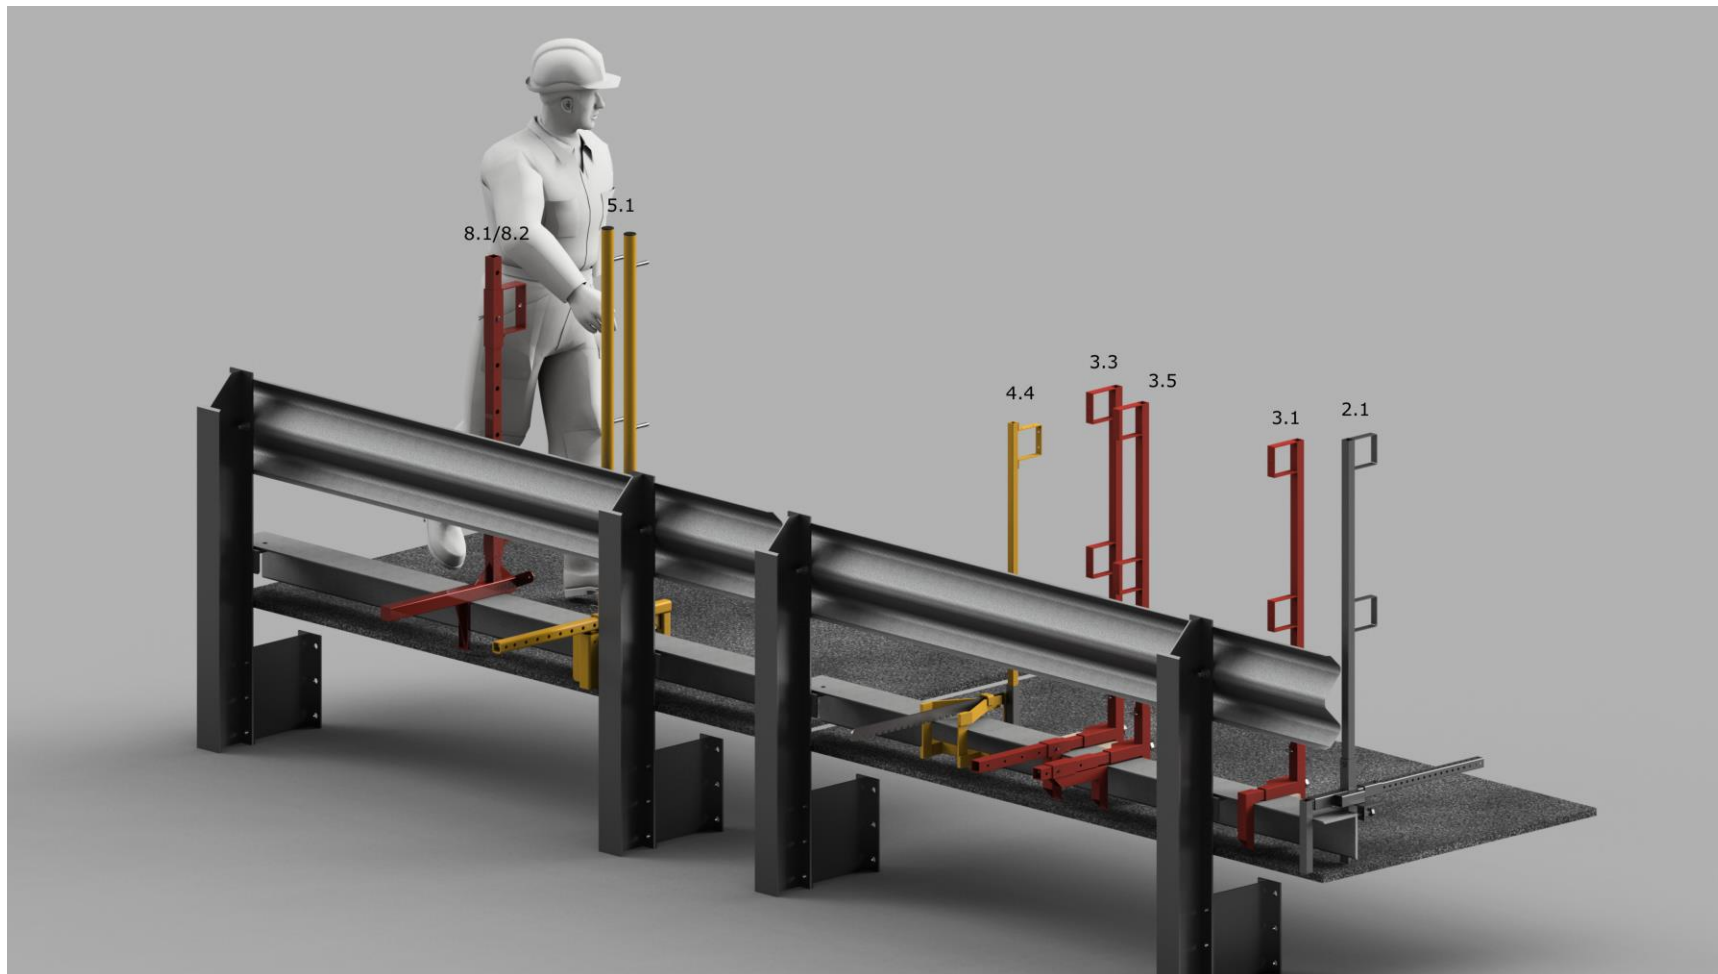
Guardrail Type 23, wheel guard fit; view from the southwest
